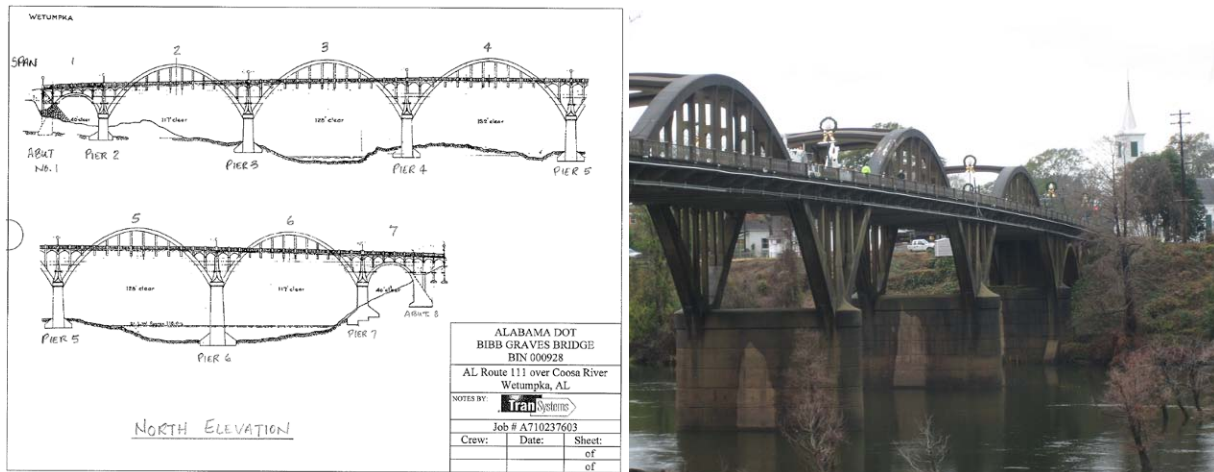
Sketch showing elevation and photograph of Bibb Graves Bridge (north face).
